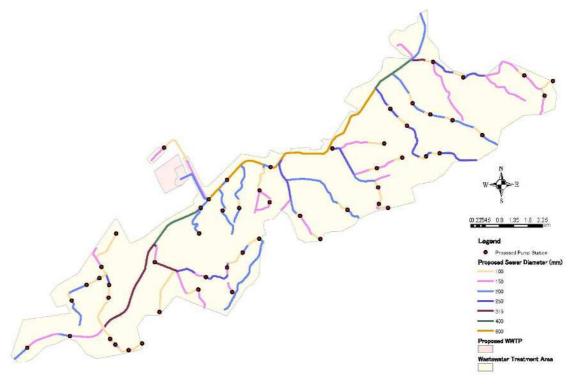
Plan of Sewer Pipelines (Moala Service Area (Nadi))
